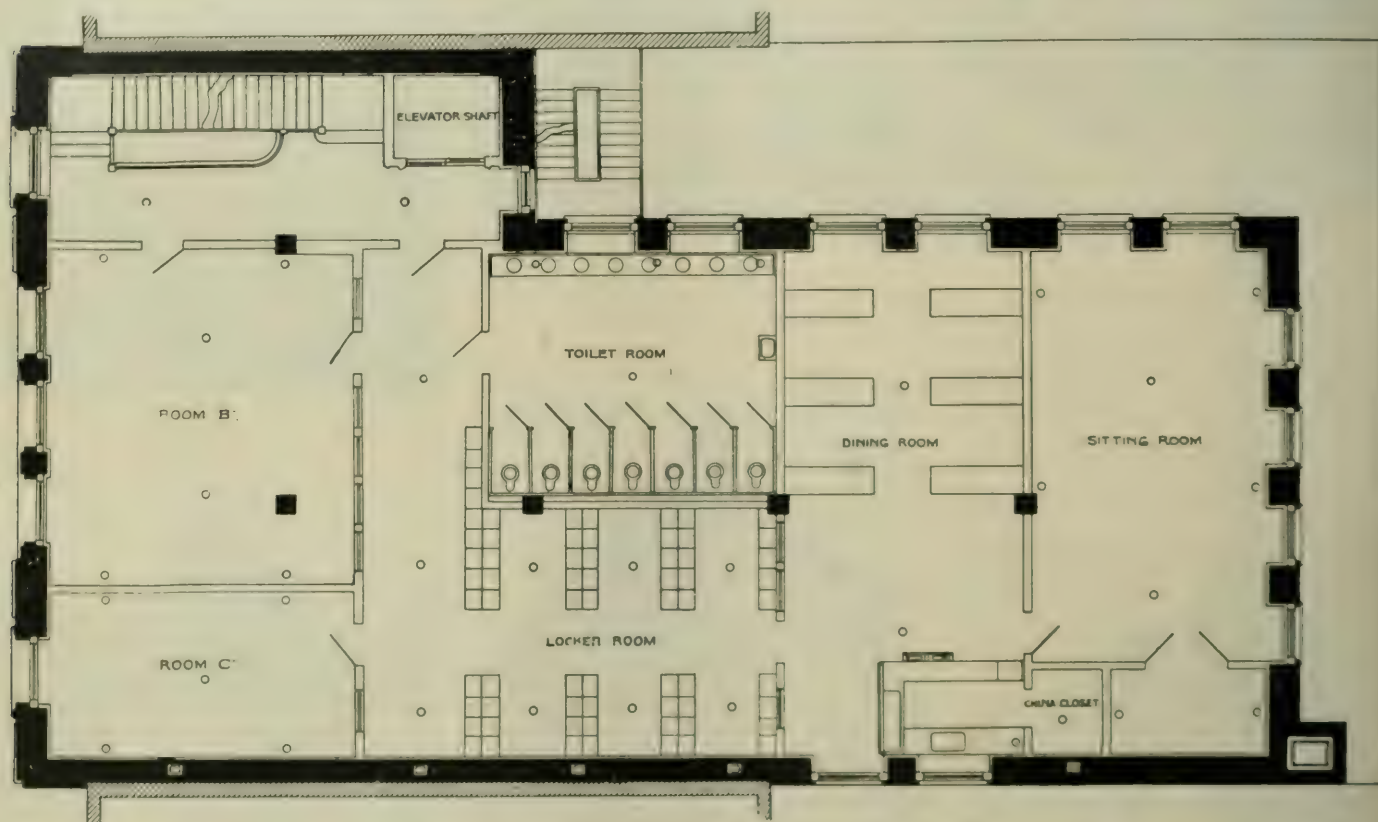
THIRD FLOOR PLAN, PLAZA CENTRAL OFFICE.
